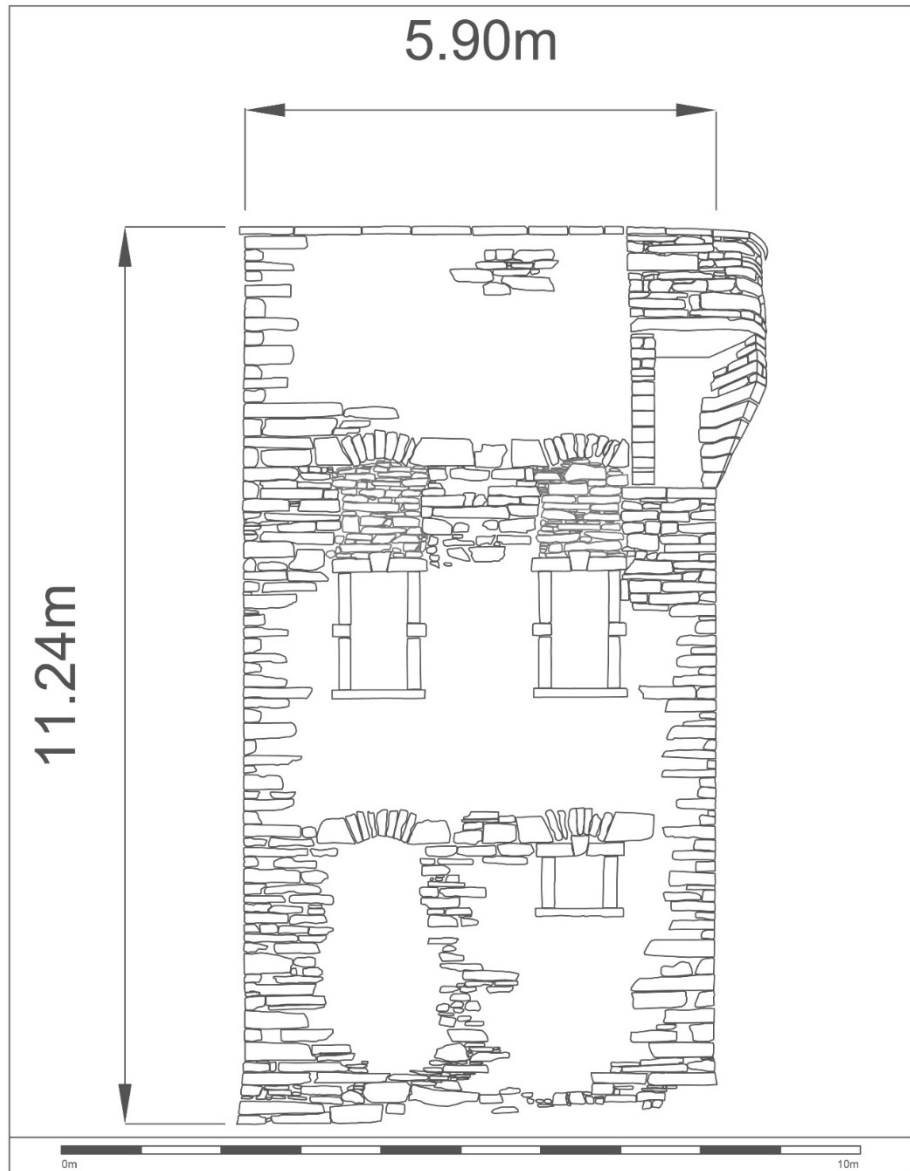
External elevation of the south-east wall of the signal tower at Malin Beg Signal Station.
